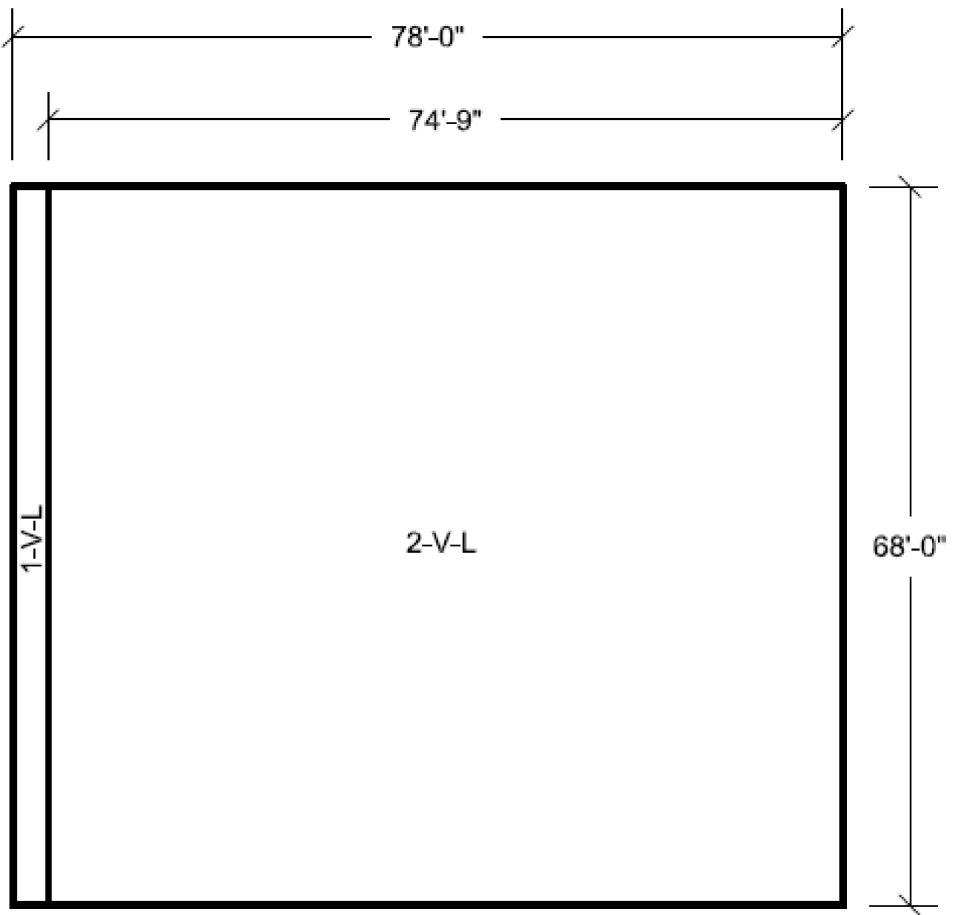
H.6-78 Pump House Internal West Wall Looking West Vertical Reinforcement Zones Far Side Face
